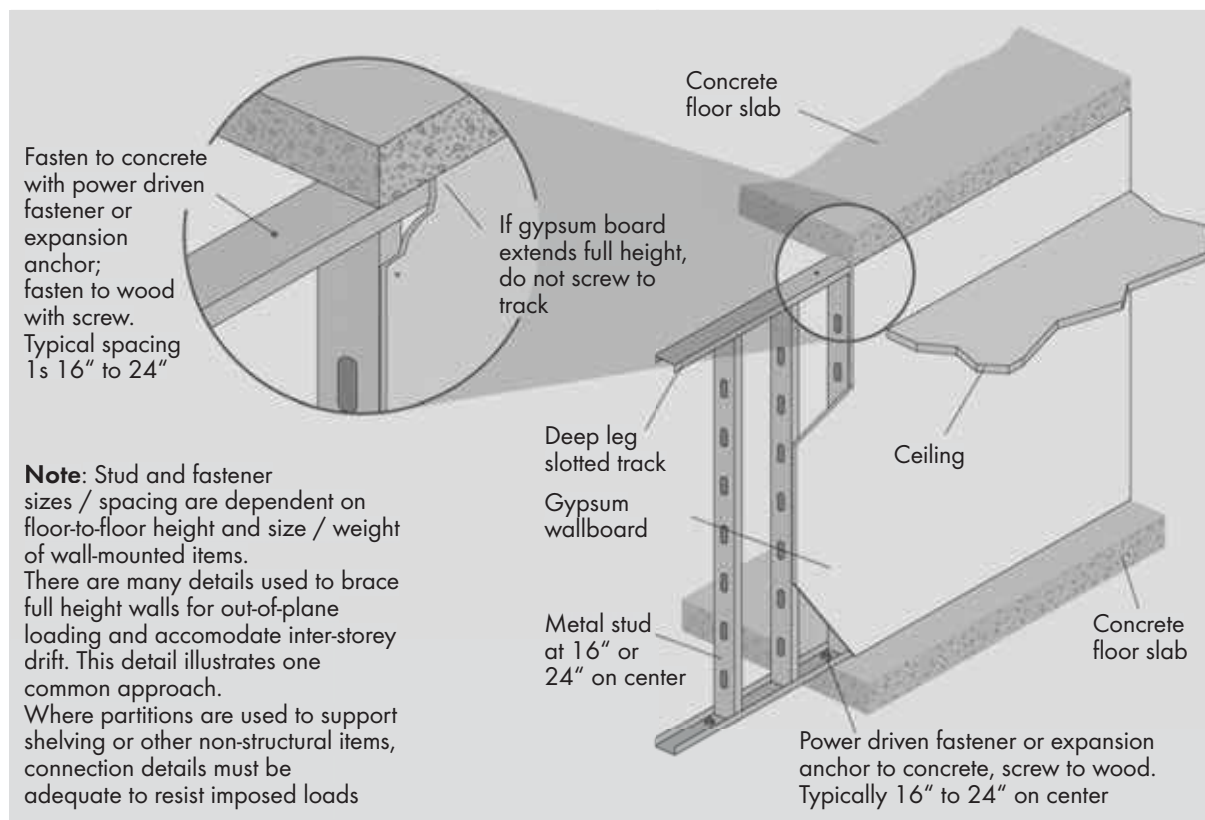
Seismic bracing for full-height lightweight gypsum board partitions /FEMA E-74 (2011)/
